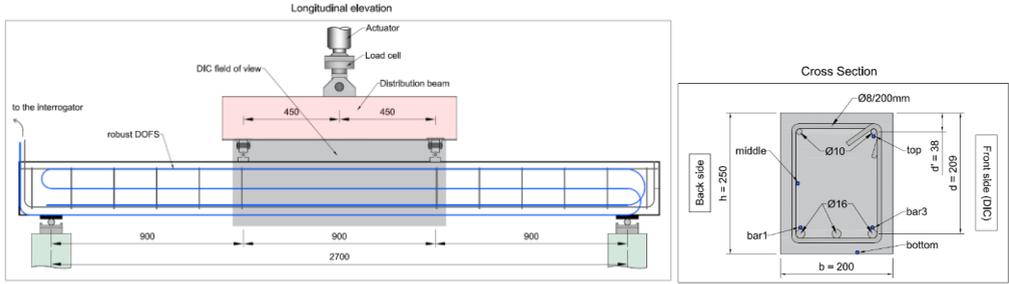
Geometry, loading setup and DOFS installation configuration for the RC beam specimen.
